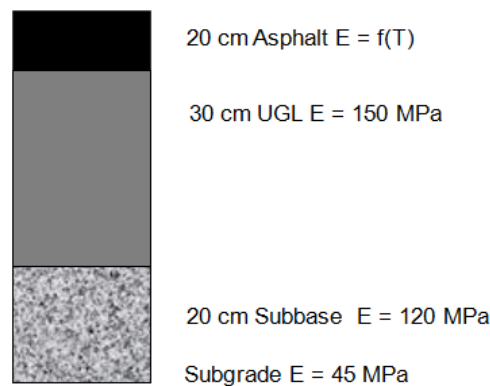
Pavement structure investigated (surface layer: 20 cm)
